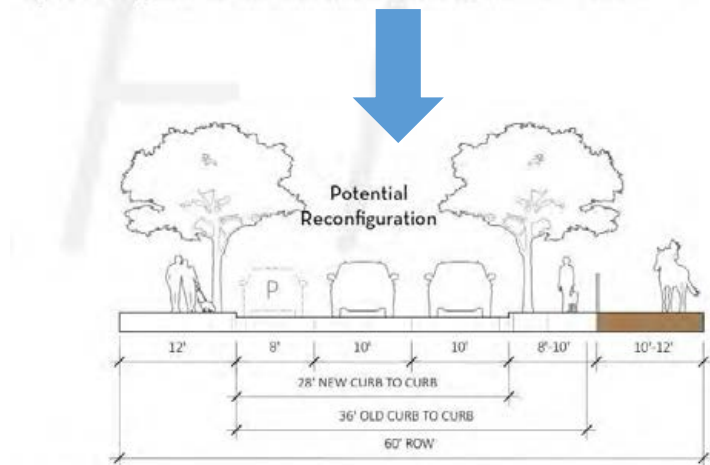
New bridle path by removing on-street parking on one side of the street.
